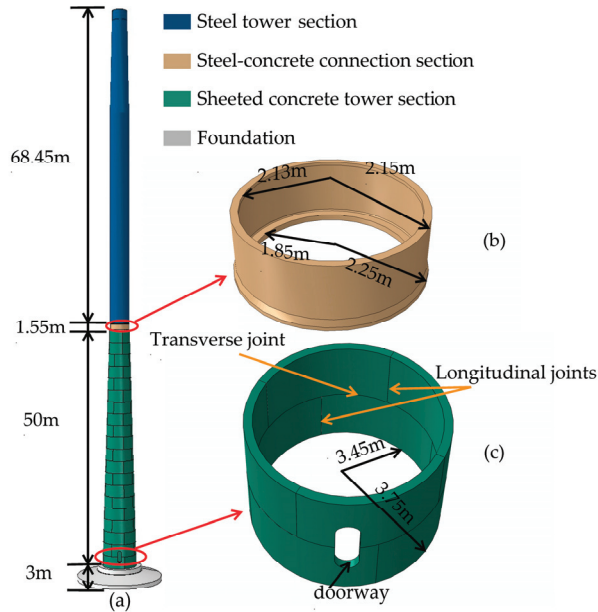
Model of the tower’s geometric parameters. (a) Model of steel-concrete wind turbine tower; (b) Steel-concrete connection section; (c) Concrete pieces of 1st and 2nd sections.
